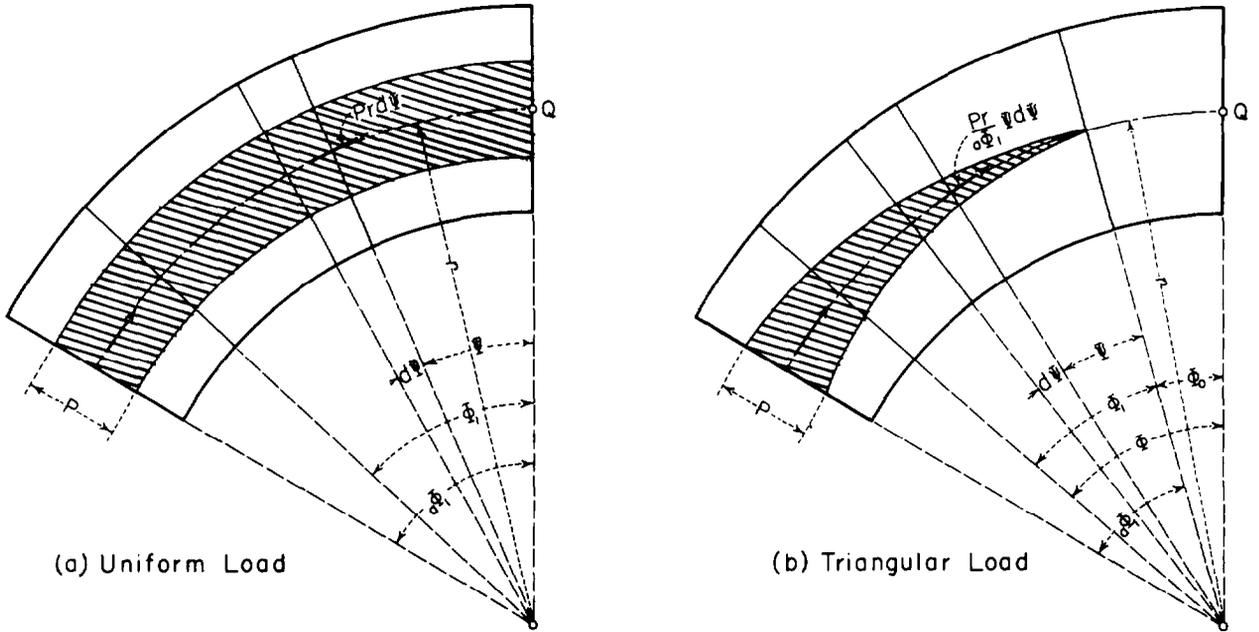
Tangential loads on arch elements.—288-D-2980
